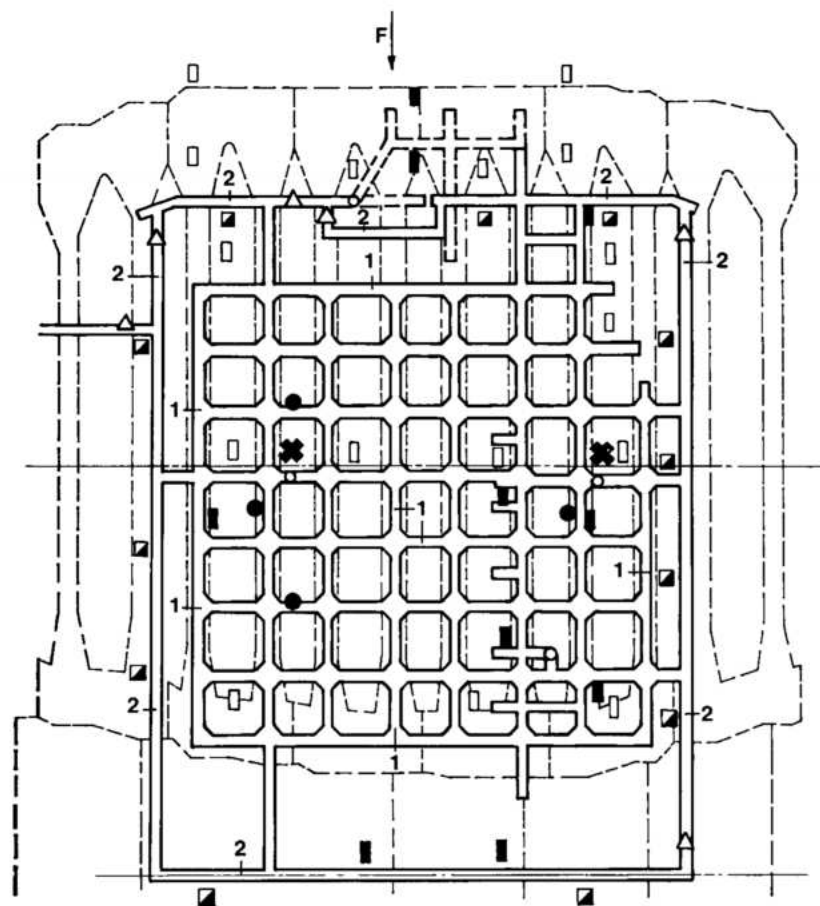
Main dam foundation treatment instrumentation of the concrete keys-plan
